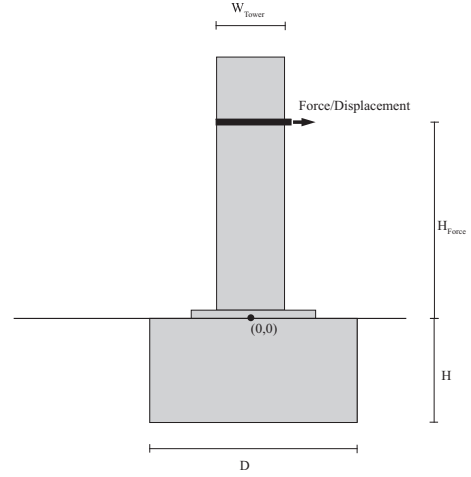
Foundation with tower on top. (Pore pressure transducers are not shown).
